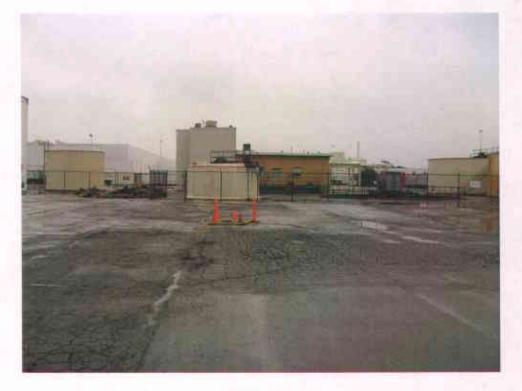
AL006, Building 282 (Waste Treatment Facility), looking south.
